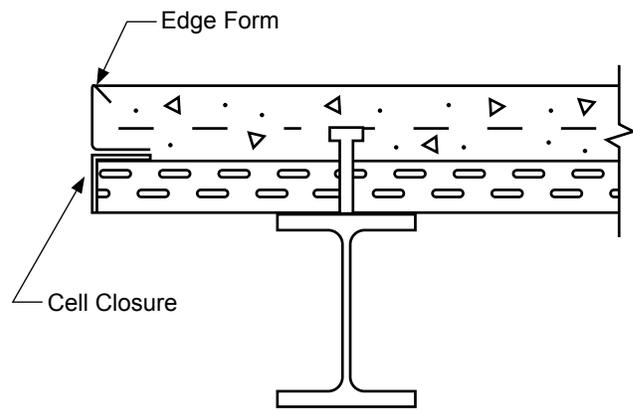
TWO PIECE EDGE FORM WITH DECK CANTILEVER ON WIDE FLANGE BEAM
